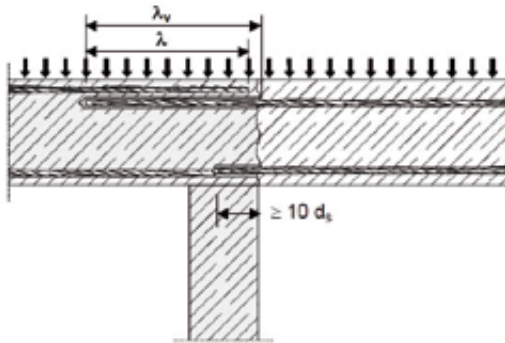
Overlap joint for rebar connections of slabs and beams
